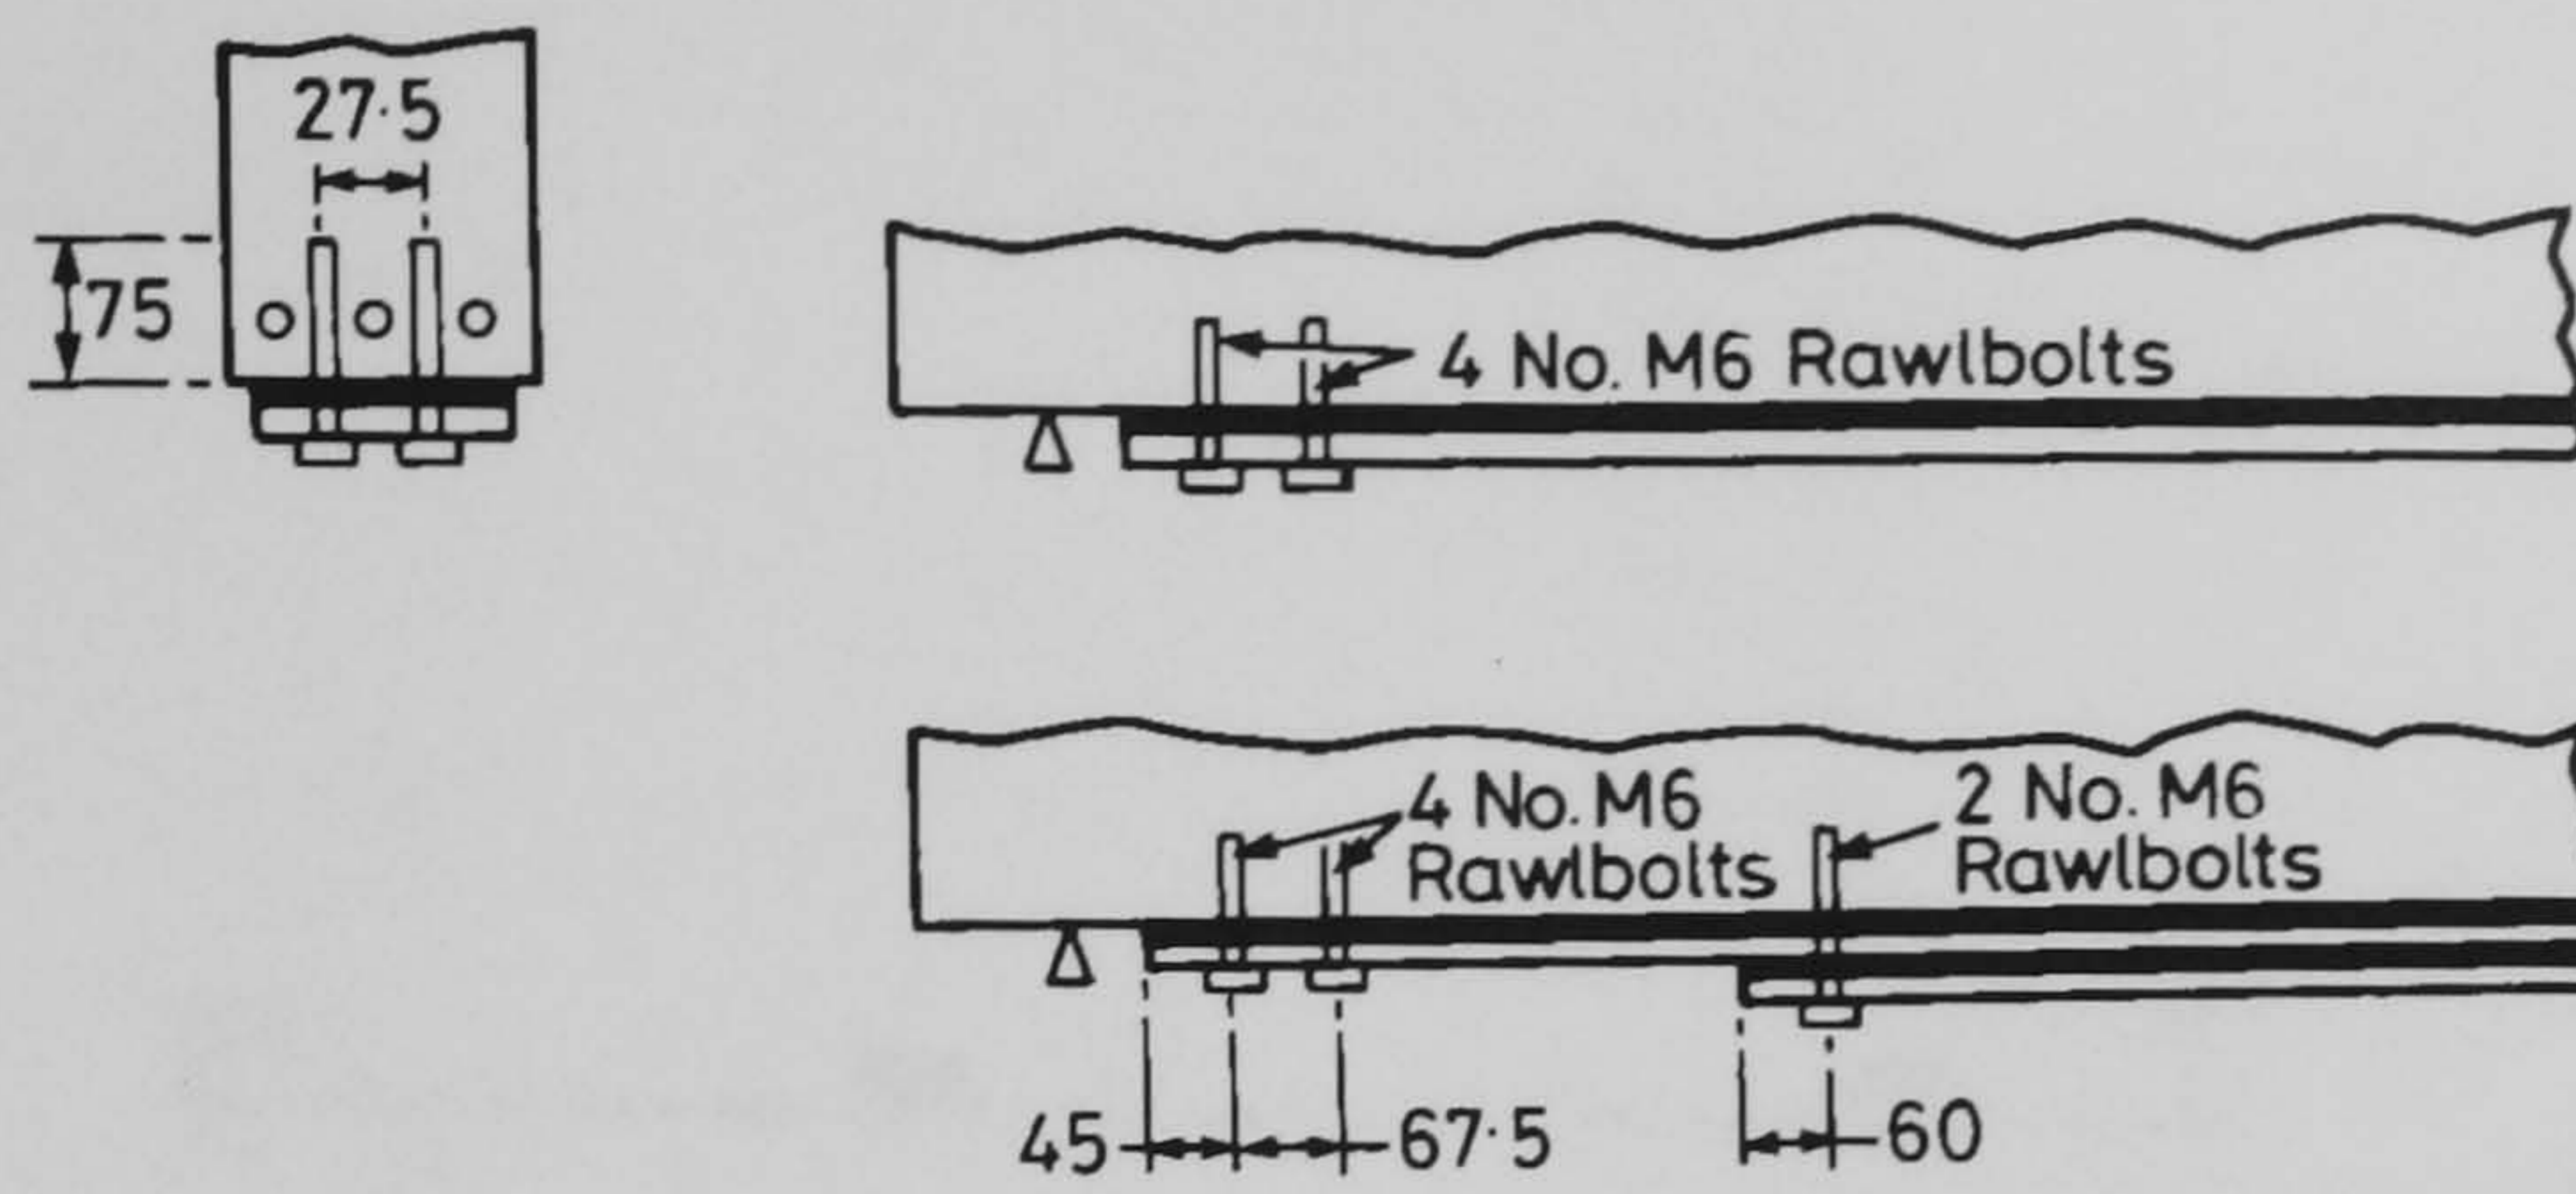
Details of anchoring steel plates with steel bolts, Jones *et al.* (1988)⁵
